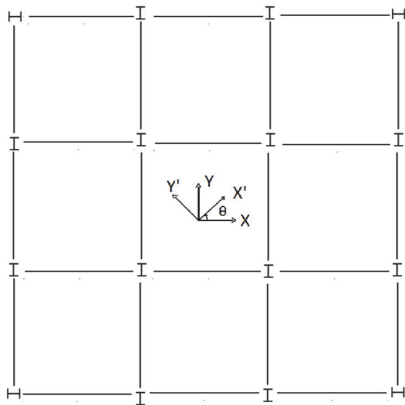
Orientation of columns for the 2-, 5- and 8-storey steel buildings
